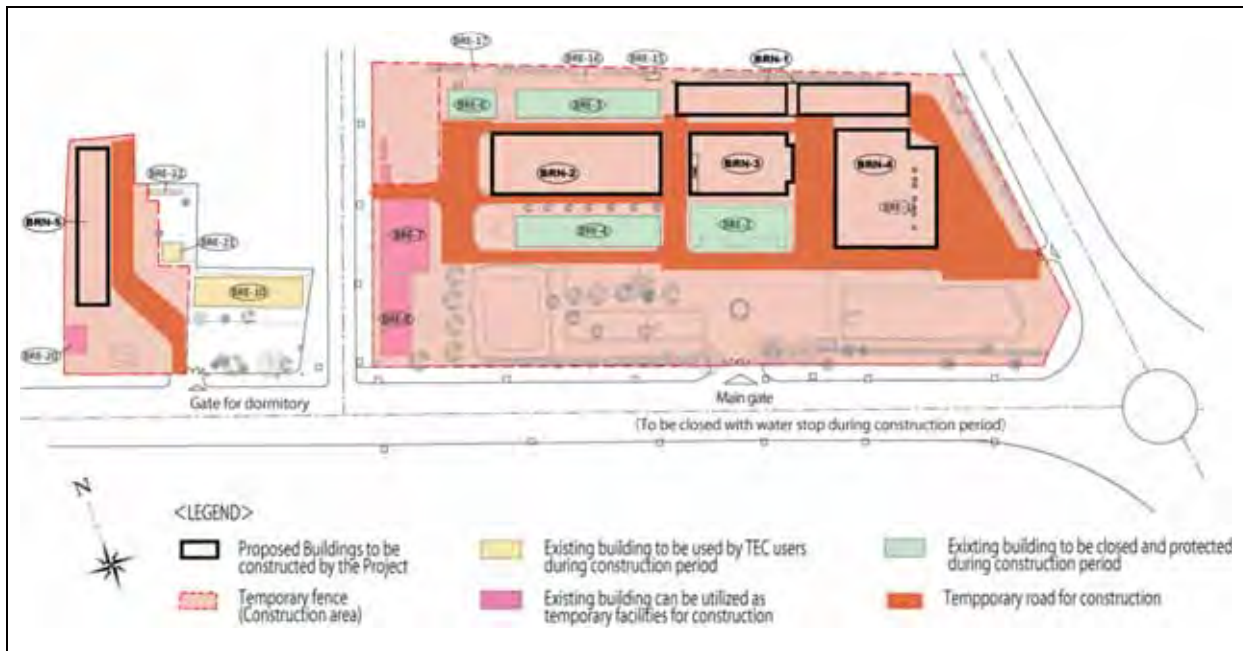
Construction Area of the Project and Area for TEC Operation (Phnom Penh TEC)
